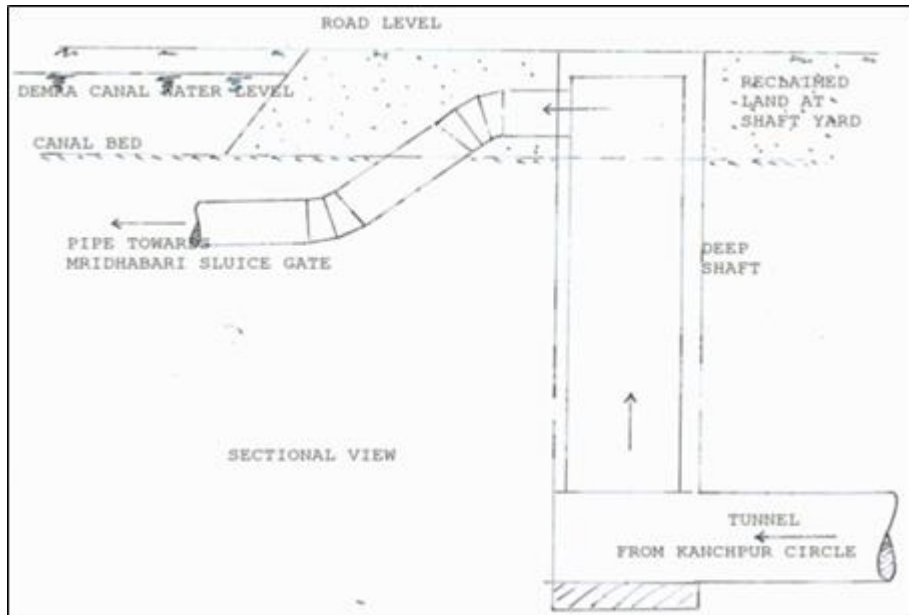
a: Indicative Arrangement of Receiving Shaft and Pipe at Demra Canal
